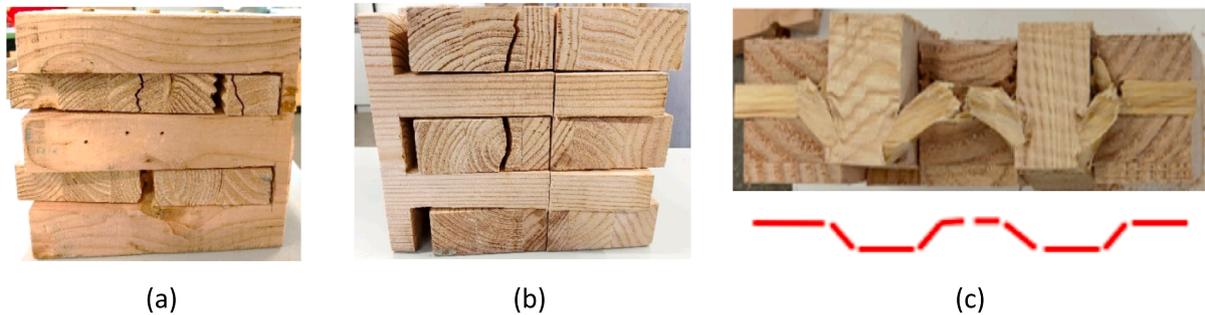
Typical failure modes in the traditional connection designs (a) tenon relish failure, (b) mortise wall failure, and (c) bending and shearing of CW dowels.
